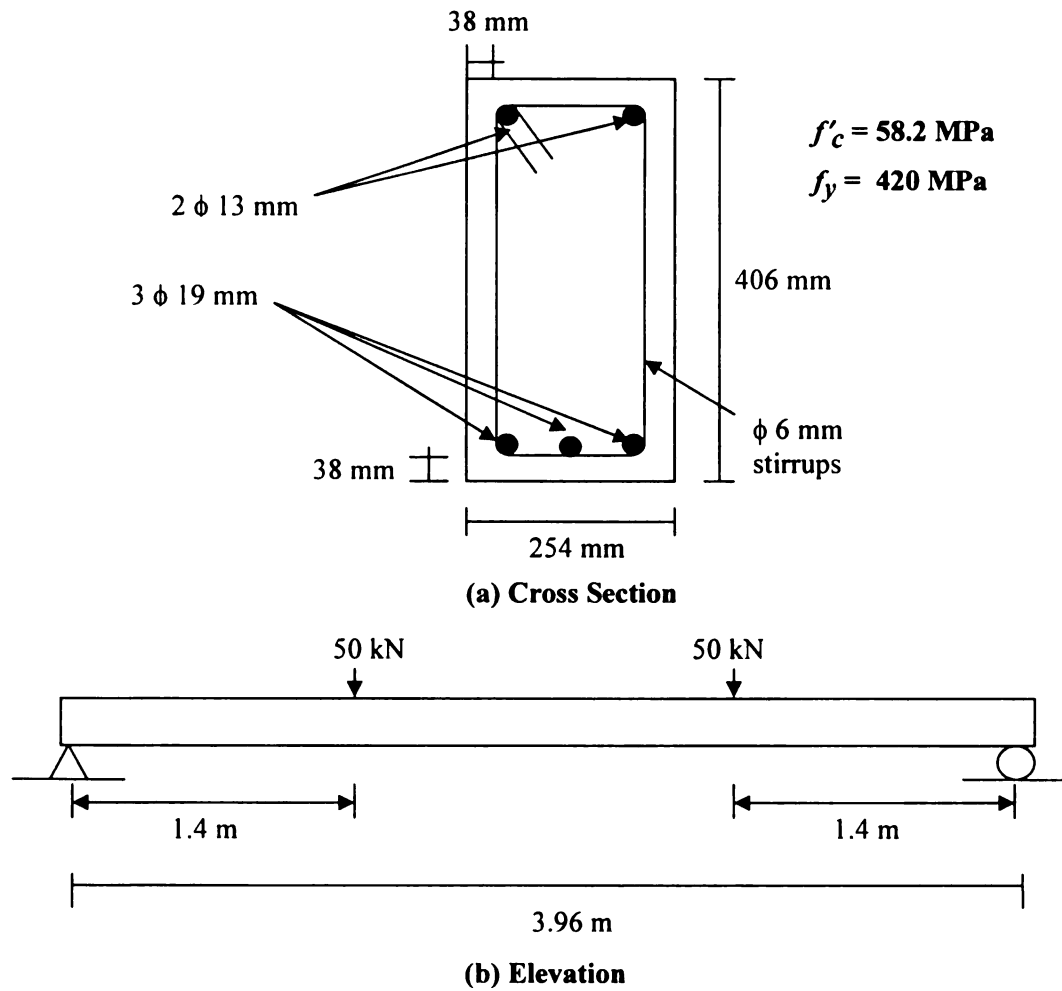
Typical layout of beam tested by Dwaikat [2009]
